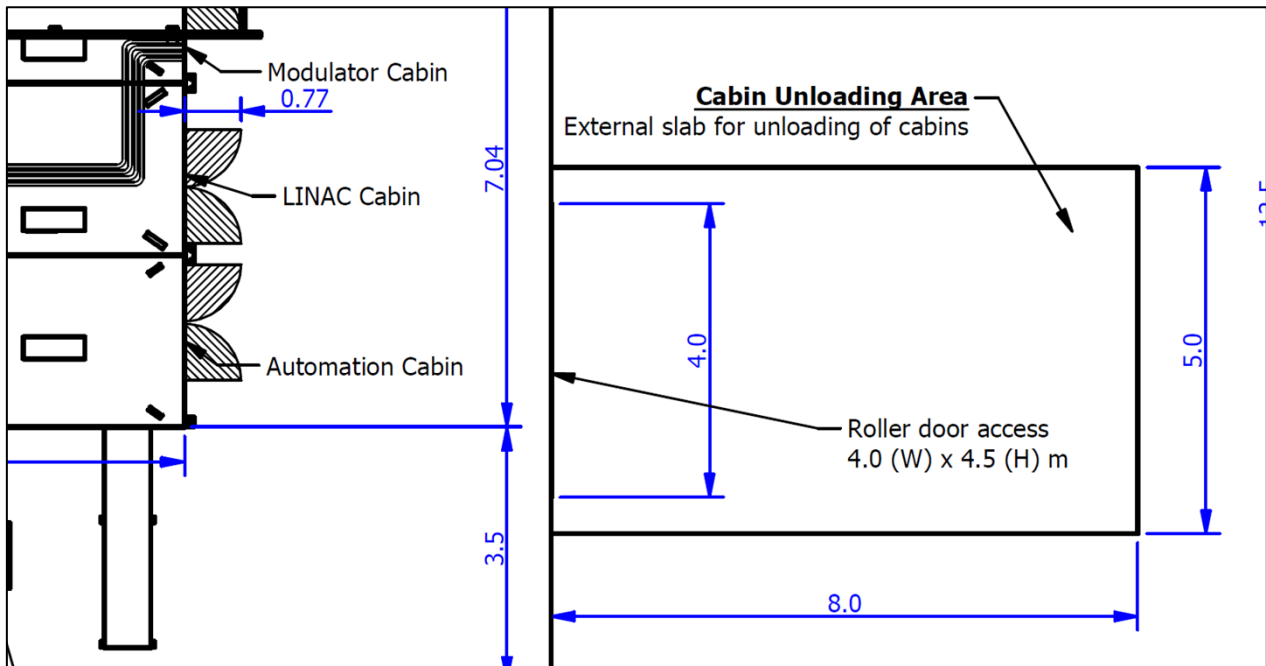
shows the recommended Cabin Unloading Slab dimensions (in meters).
